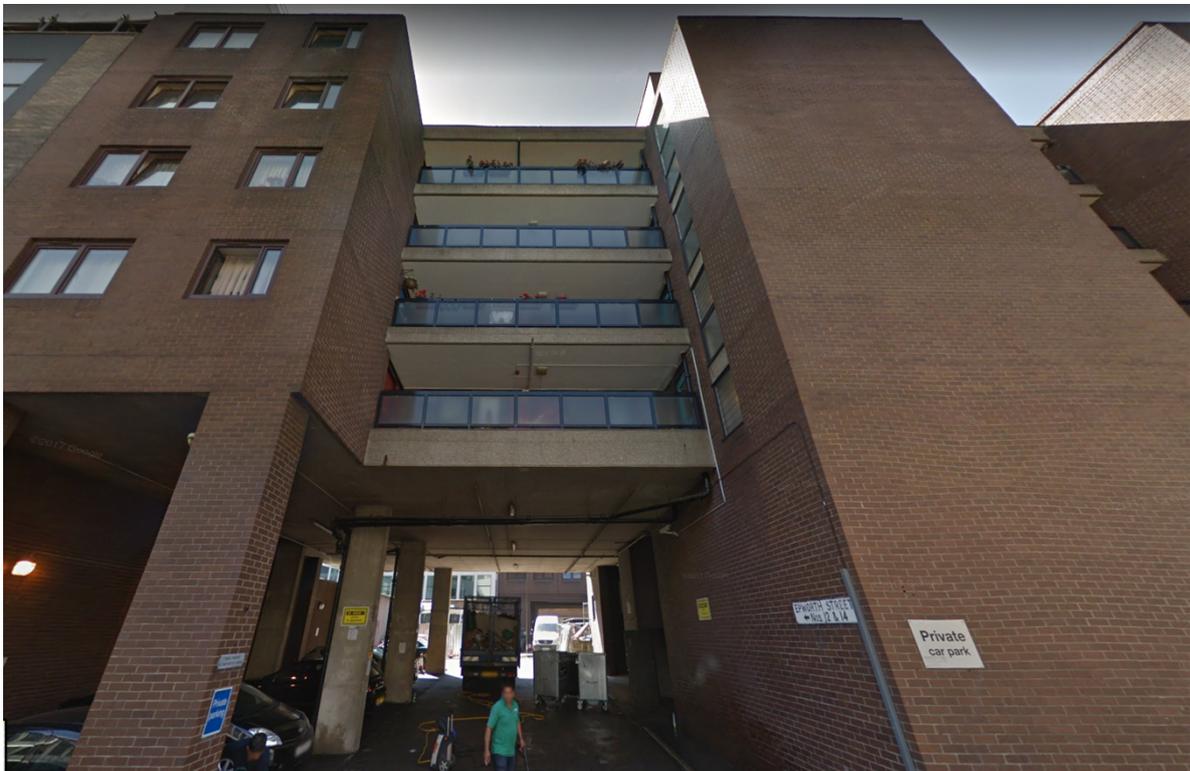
View of towards the front entrance of the existing car park at 10 Epworth Street
